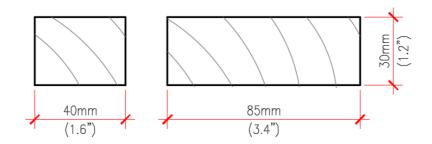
Section type of wooden structure (Class C18 Resistance)
